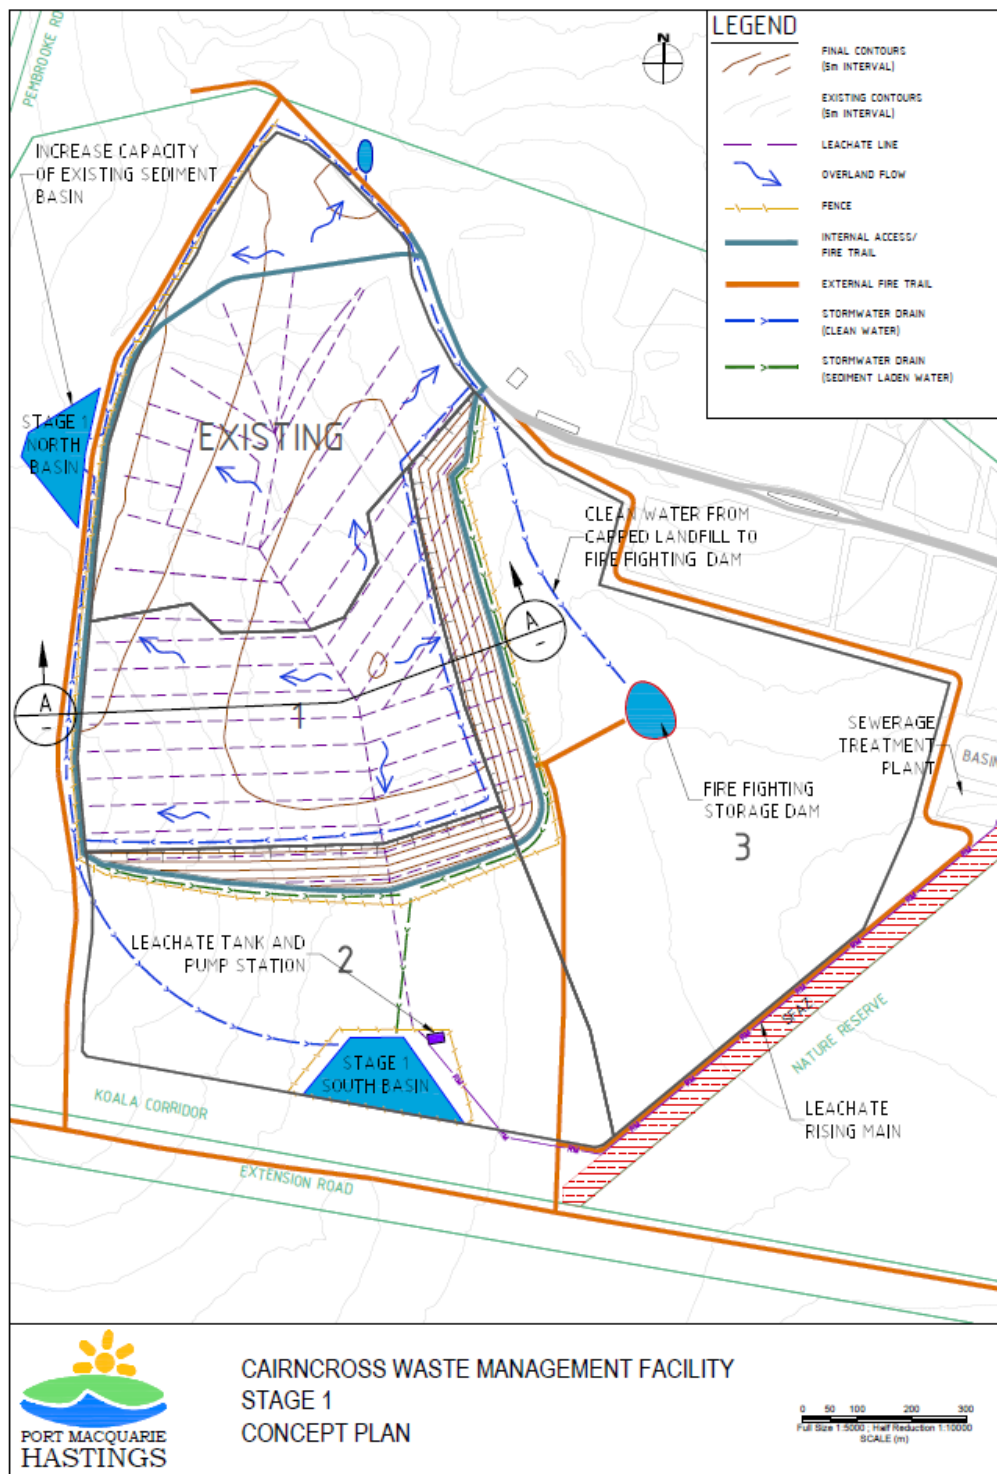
Proposed landfill layout and stages (Stage 1)
